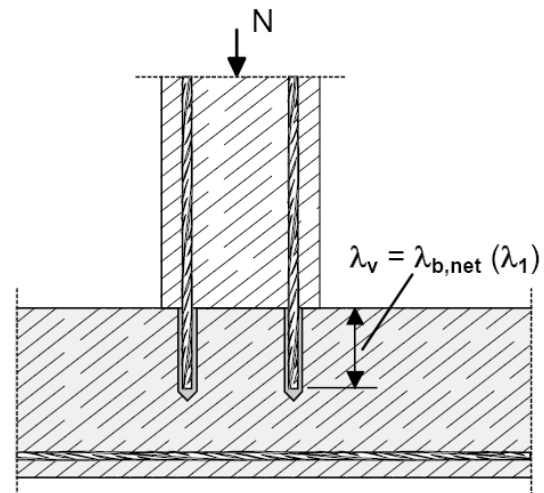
Overlap joint at a foundation of a column or wall where the rebars are stressed in tension
